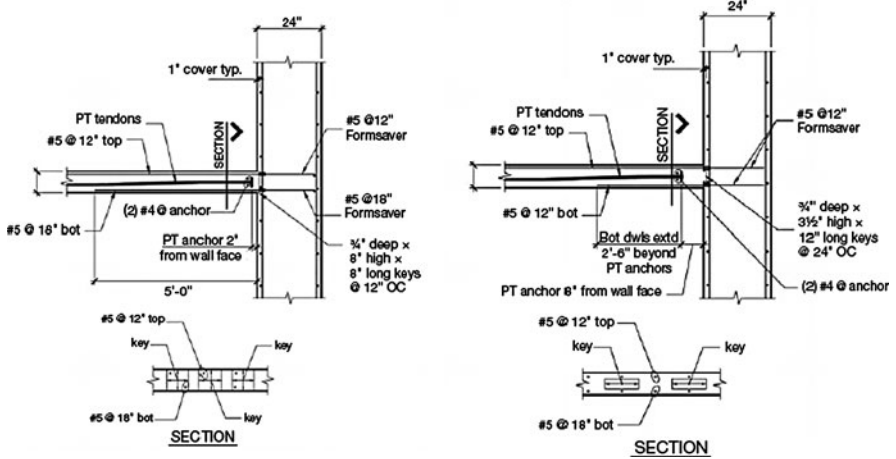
Slab-to-wall connection details (Klemencic et al., 2006)
